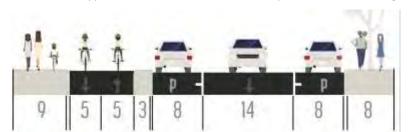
Revised typical street cross section for Taylor Avenue (looking east).
